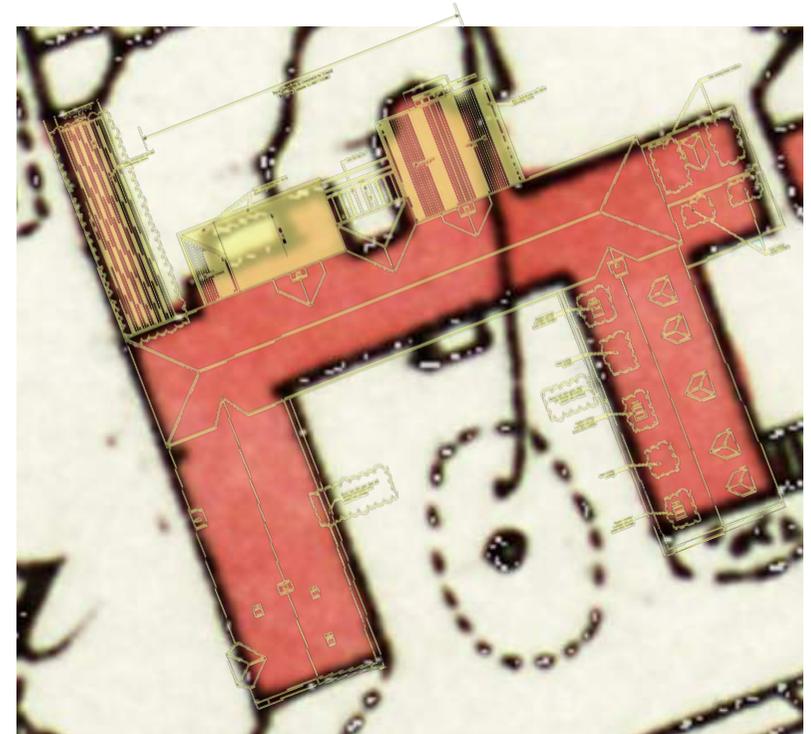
1883-4, 25" Ordnance Survey map, with proposed roof plan overlaid.
